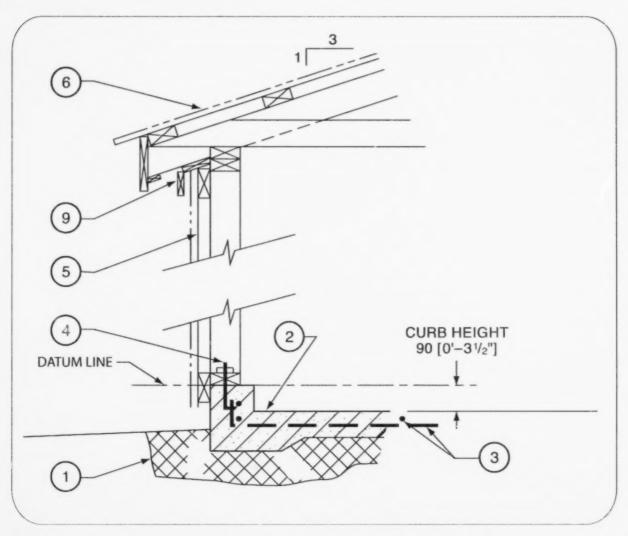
Details for construction (dimensions are in mm [ft-in.]).
